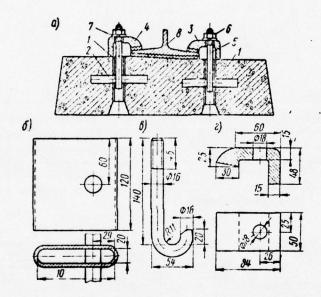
Construction of the fastening of the rail to the sleeper-footing:
